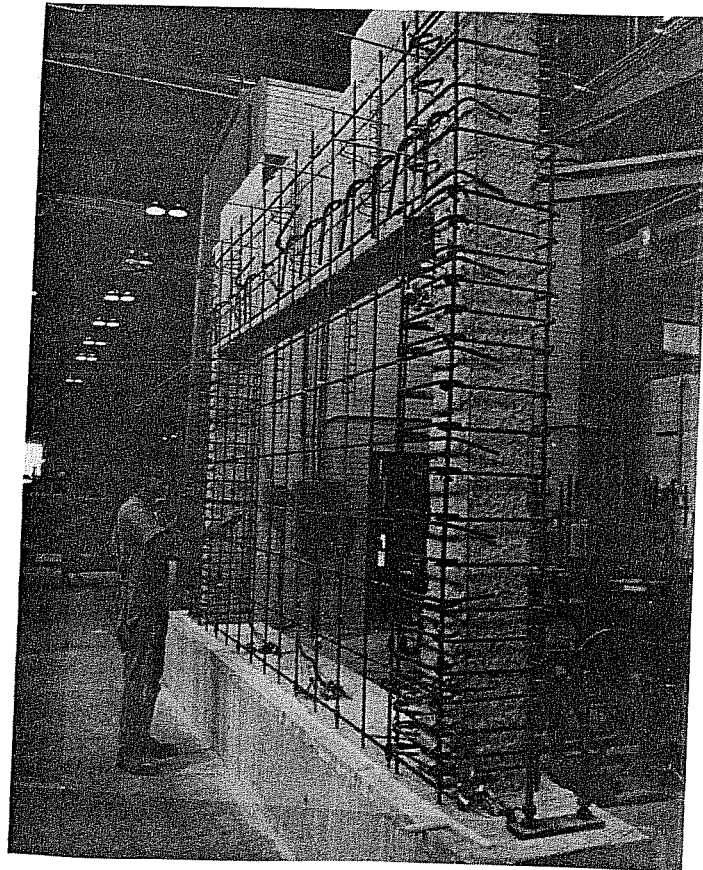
Full view of reinforcing cage of Jimenez's specimen [3].
